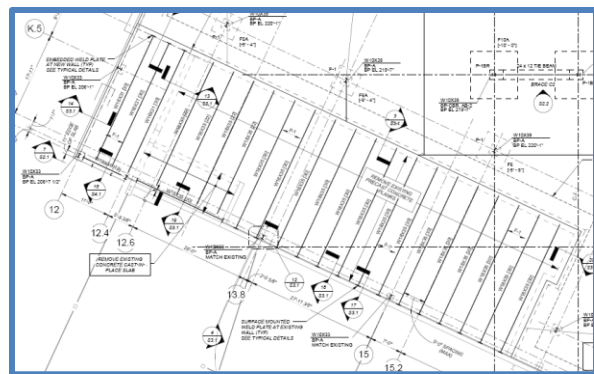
Structural Steel Layout at Kitchen Area of Existing Building
